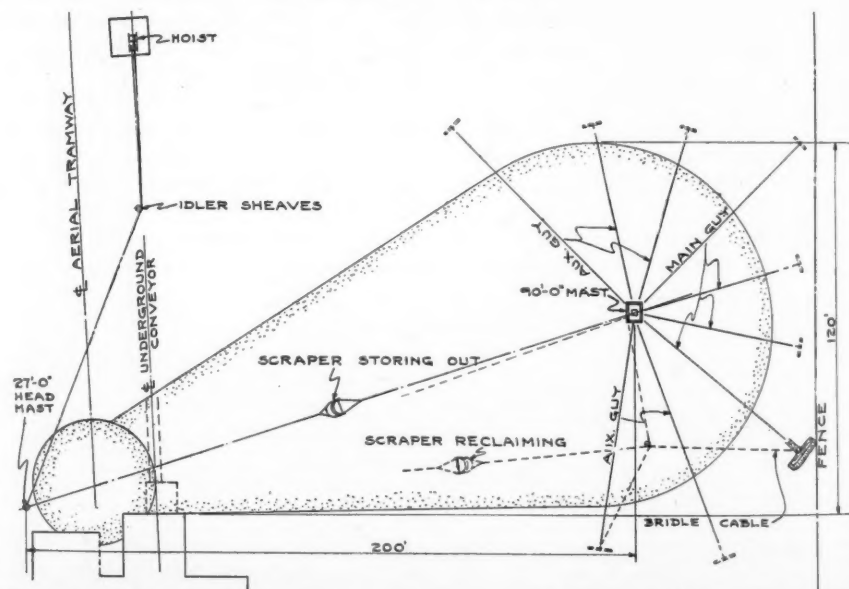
Plan showing layout of gypsum storage system at the Iowanna mill
